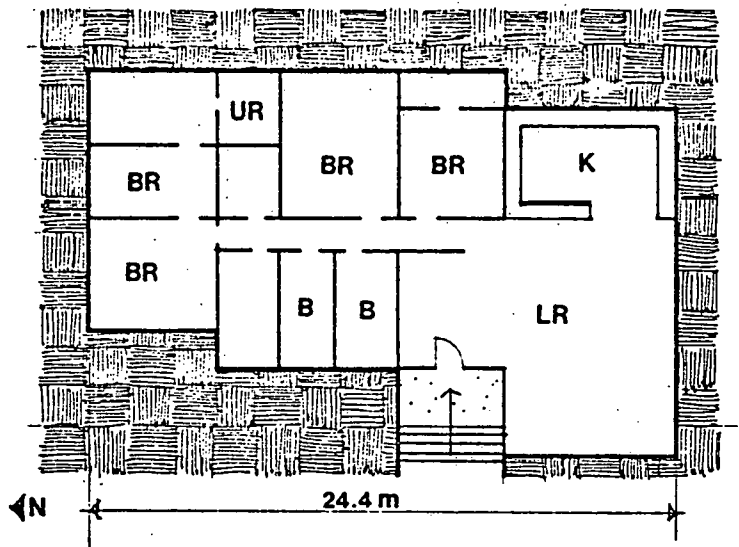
Site C is a large concrete block structure with an insulated conventional flat roof and underground walls insulated 3 feet down from the roof.
